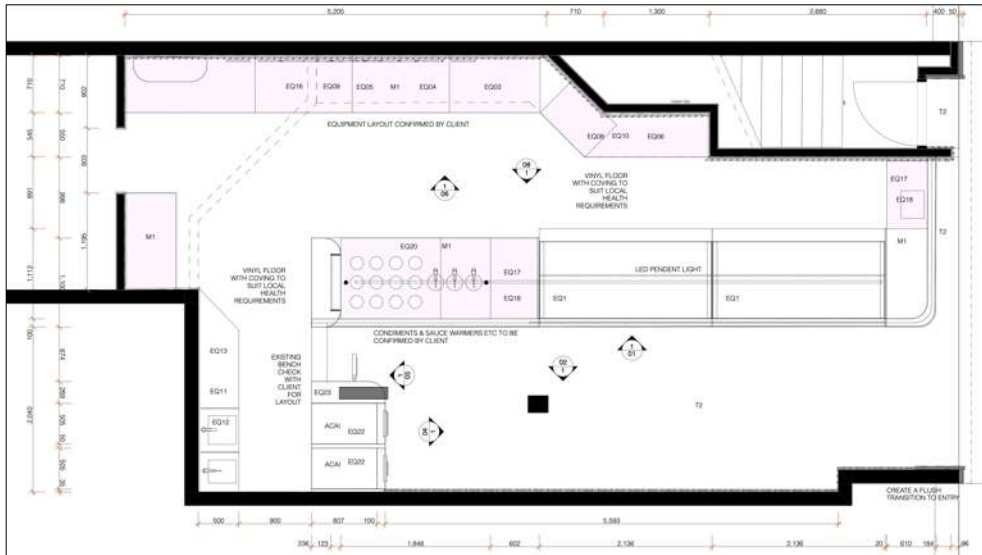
The proposed floorplan for the commercial, first-floor tenancy at No. 106 The Corso, Manly.
